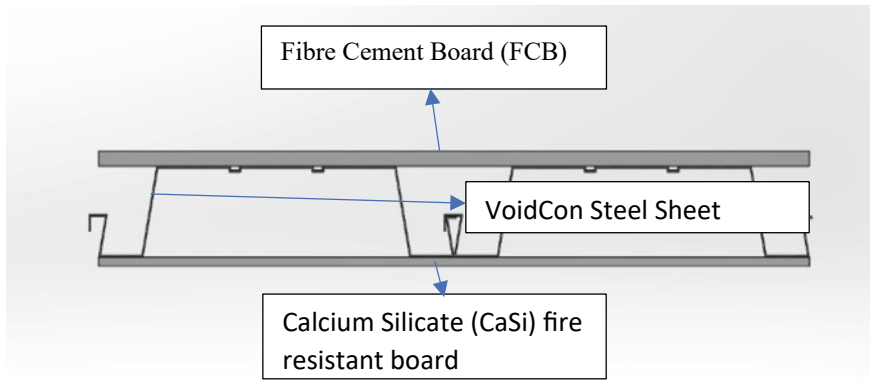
Sandwich floor system used for protecting the structural system and carrying load. Fire is applied from the bottom of the samples
